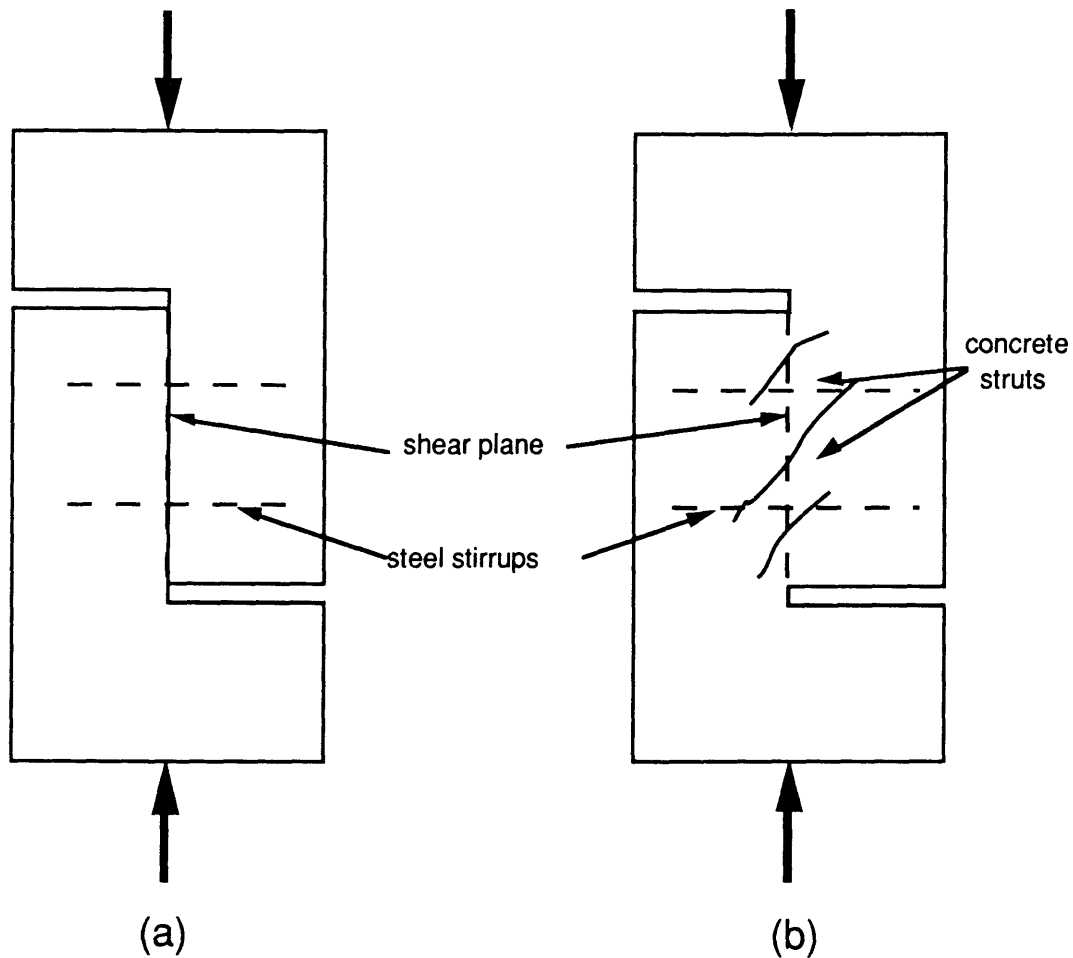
Shear transfer push-off test specimen: (a) initially cracked shear plane; and (b) initially uncracked shear plane
